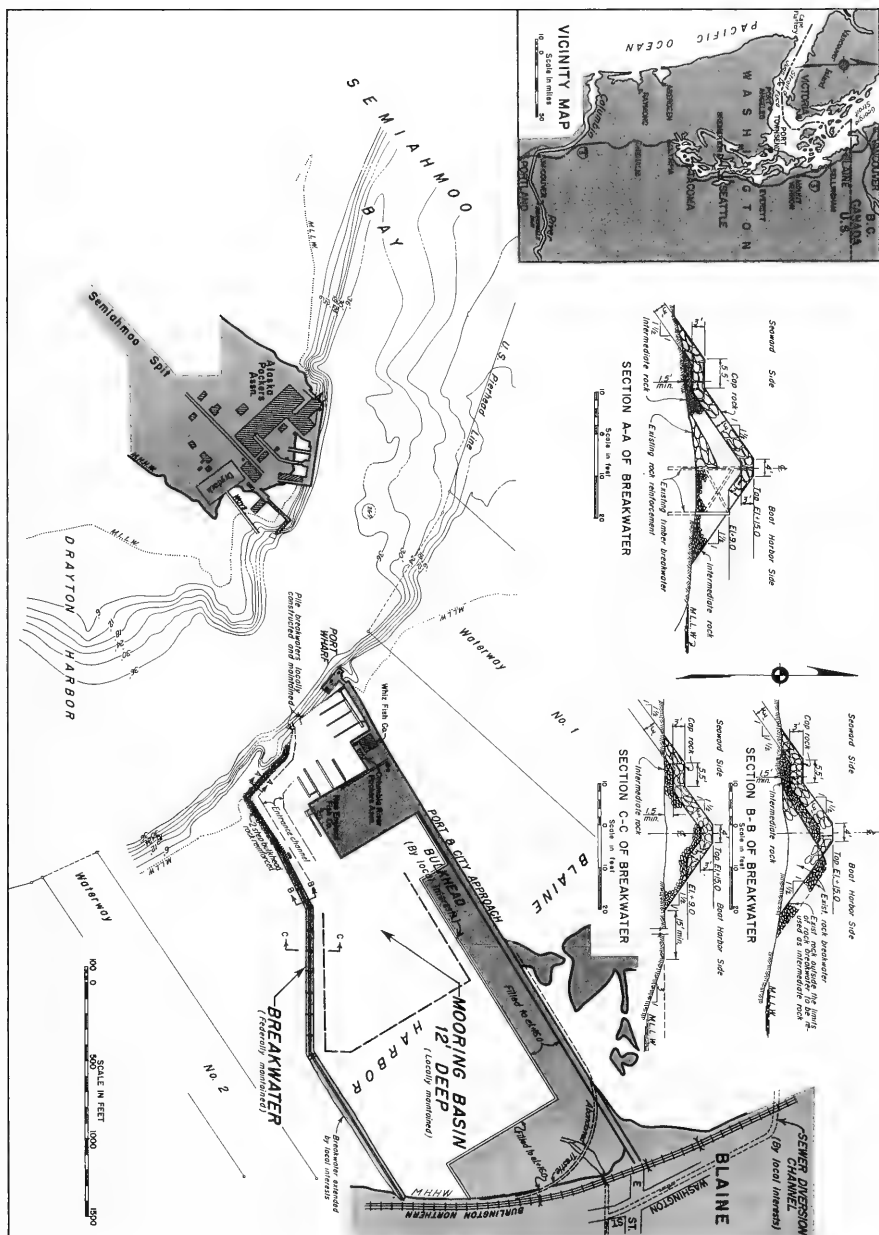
Site layout at Blaine Harbor, Washington (revised 1972)
